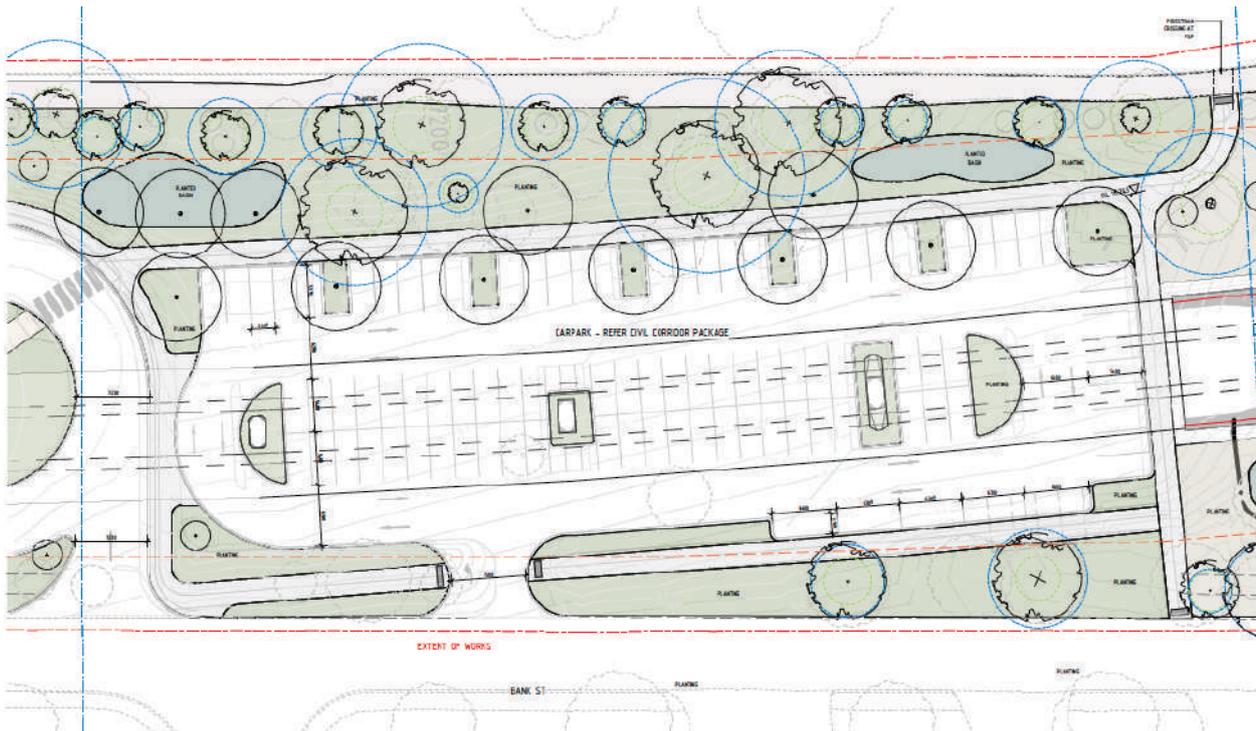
Proposed Oats Street Train Station Long Term Park 'n' Ride Parking Facilities (located to the south of the station)
